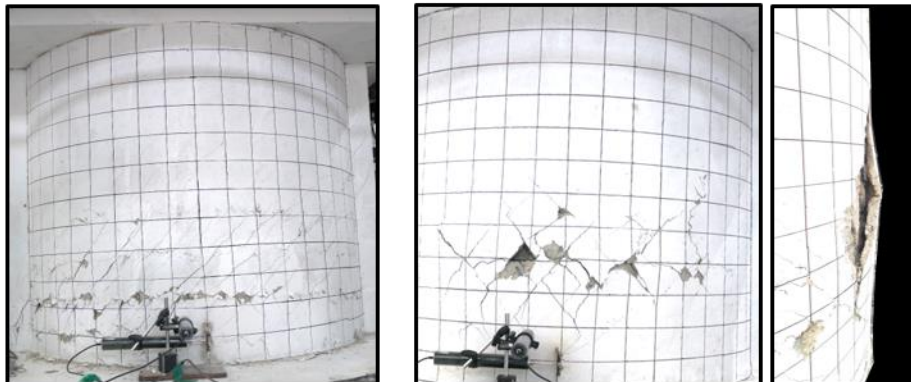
Diagonal cracks and compressive strut and failure mode
